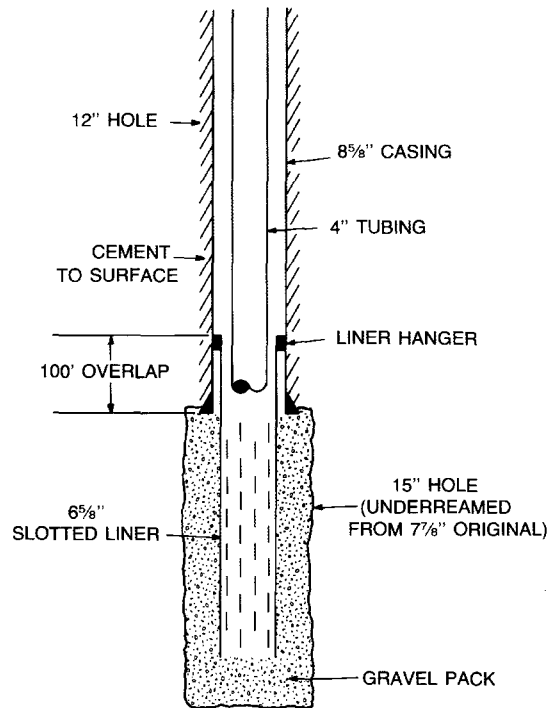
Downhole detail of gas storage well, Mist gas field (from Oregon Natural Gas Development Corporation, 1981, Mist underground storage site certificate application).
